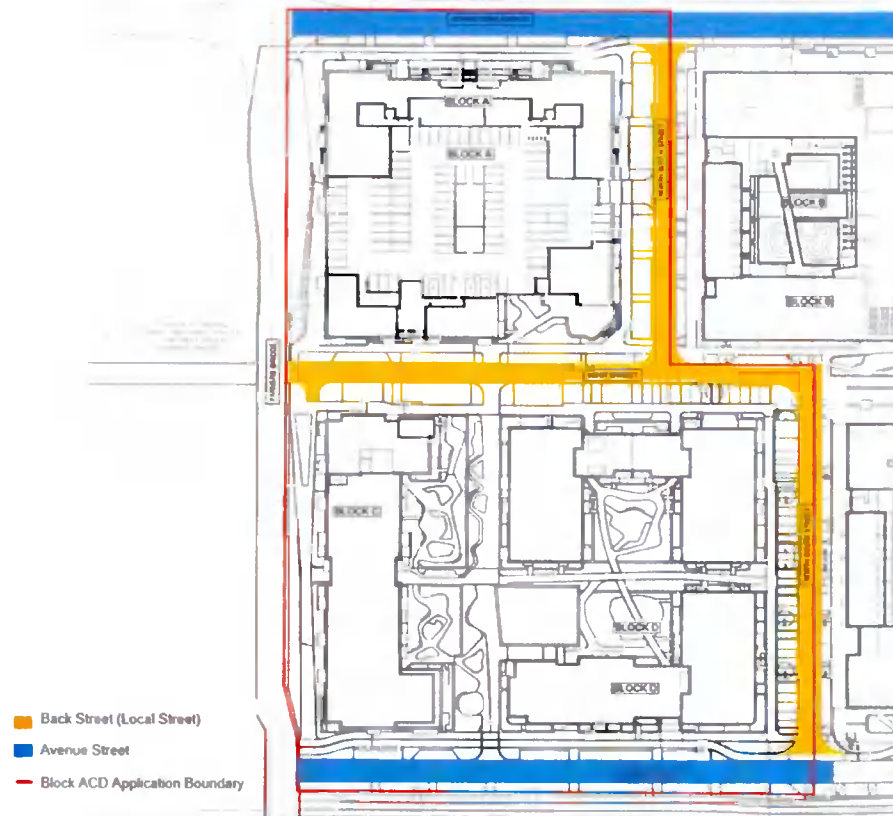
Extract from the Roads Engineering Report, prepared by Atkins Consulting Engineers showing Block A, C & D Street Typology and Layout
